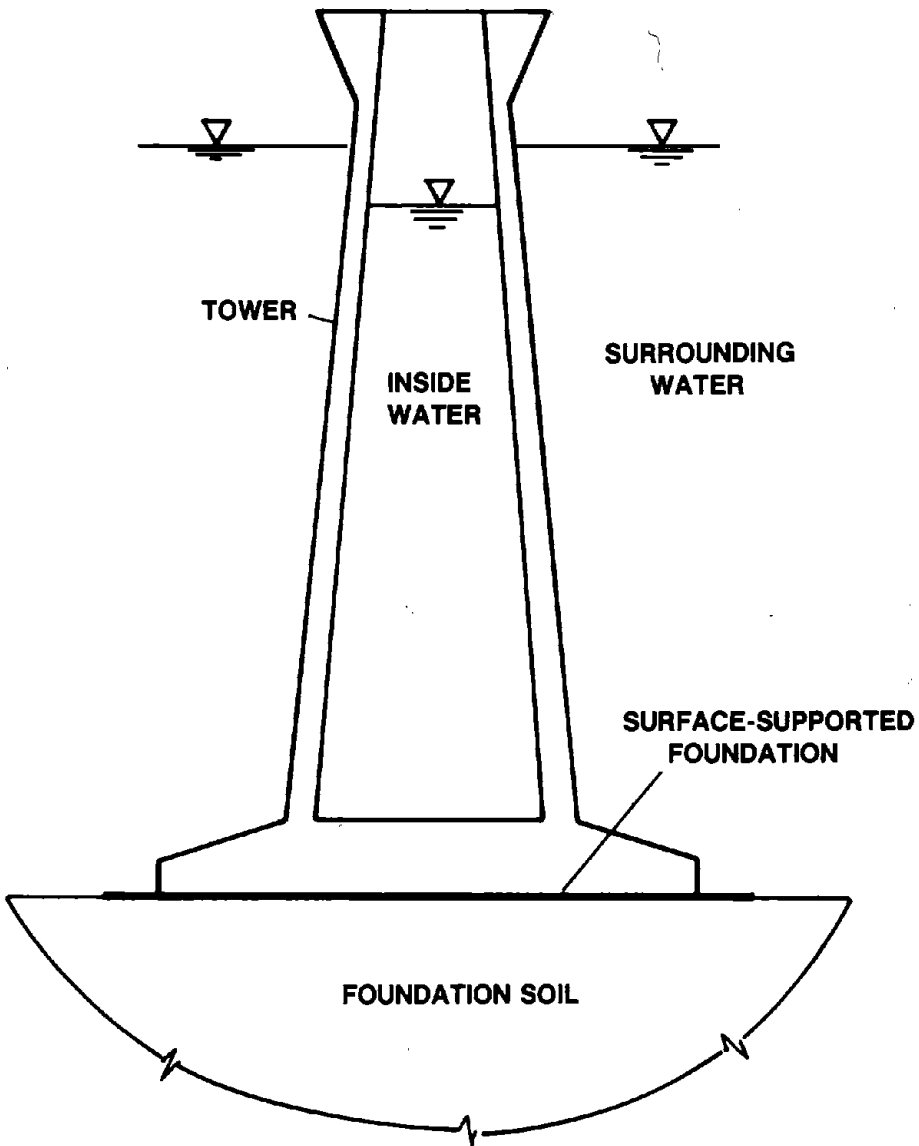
Idealized Tower-Water-Foundation-Soil System
